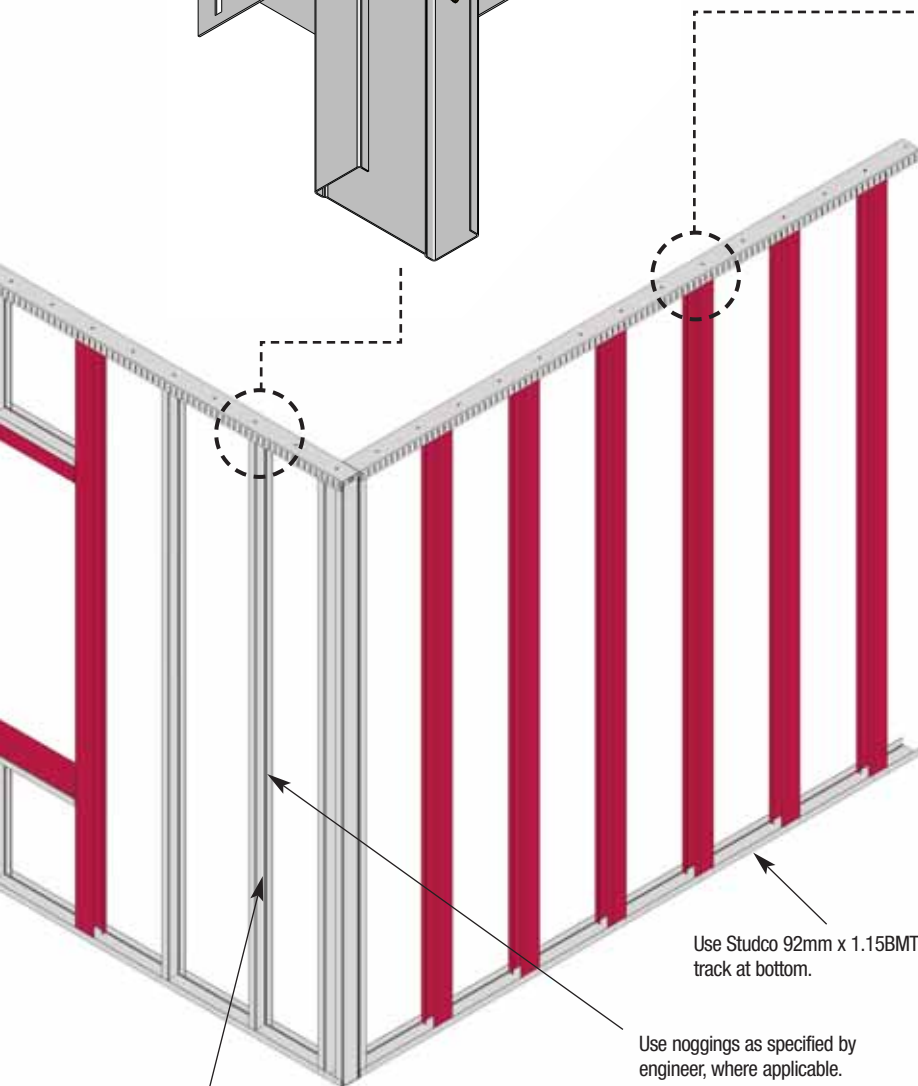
Wall Stud To Slotted Deflection Track Connection
